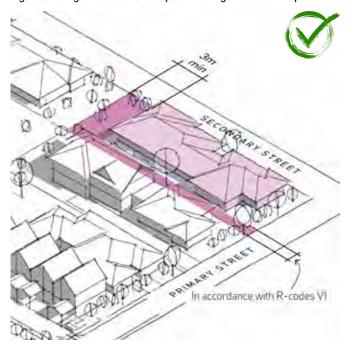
Single House and Grouped Dwellings - Lot Boundary Setback Example Diagram
